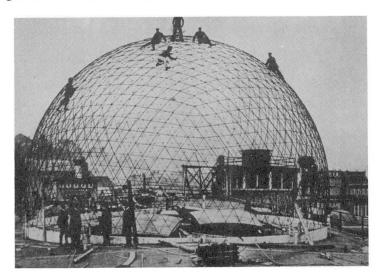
Bauersfeld's 1922 cable-net dome, 16 m in diameter for an experimental reinforced concrete shell.
